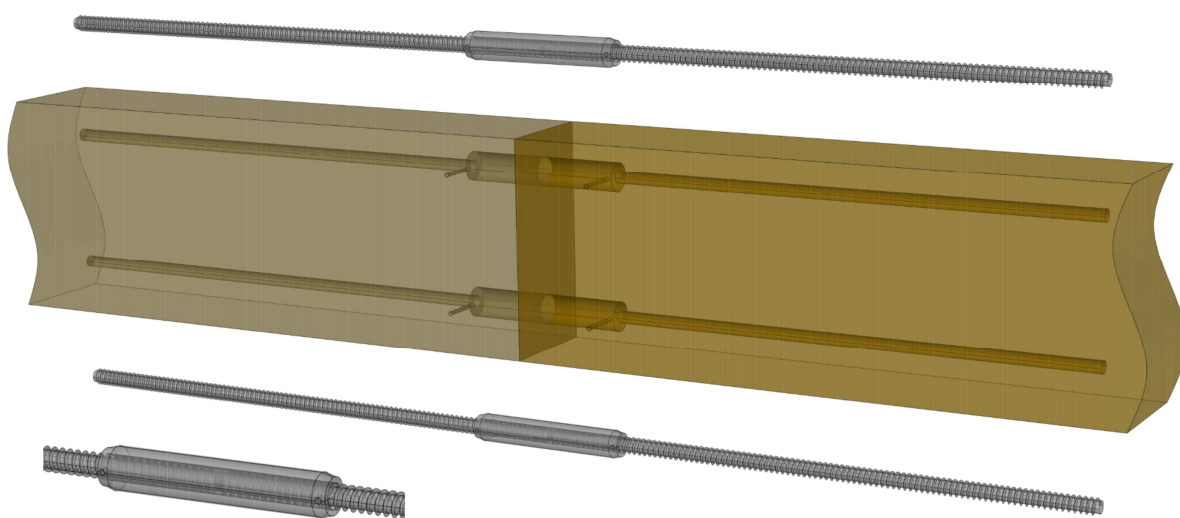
Layout of splice connection with long threaded rods and grout-filled couplers.
